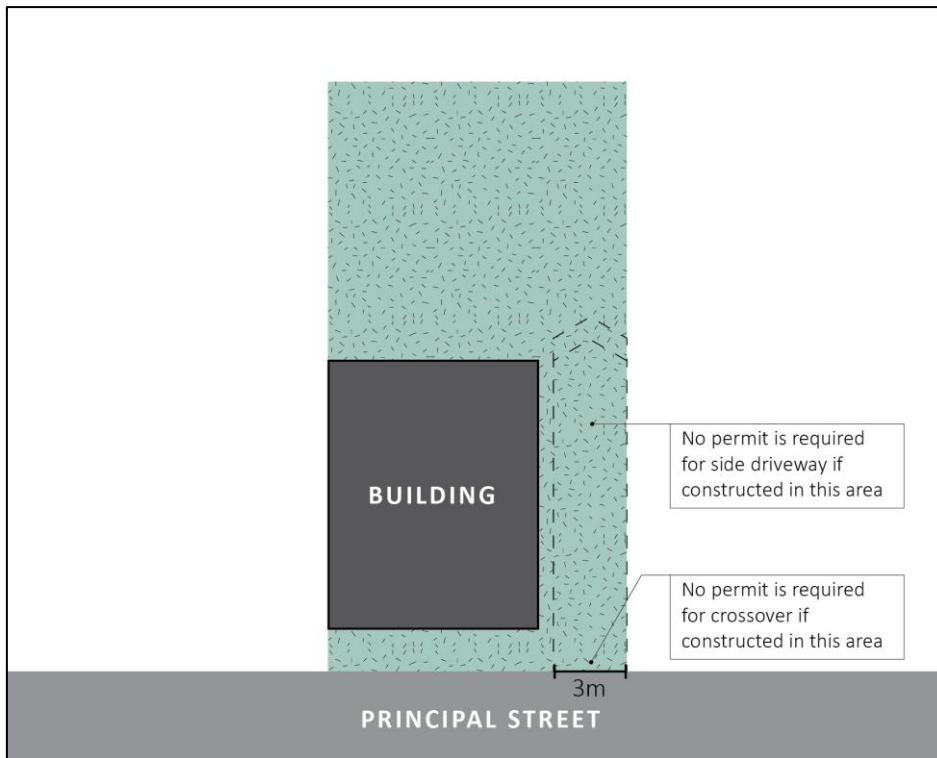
Construction of a new crossover and driveway is permit exempt if constructed in this location.
